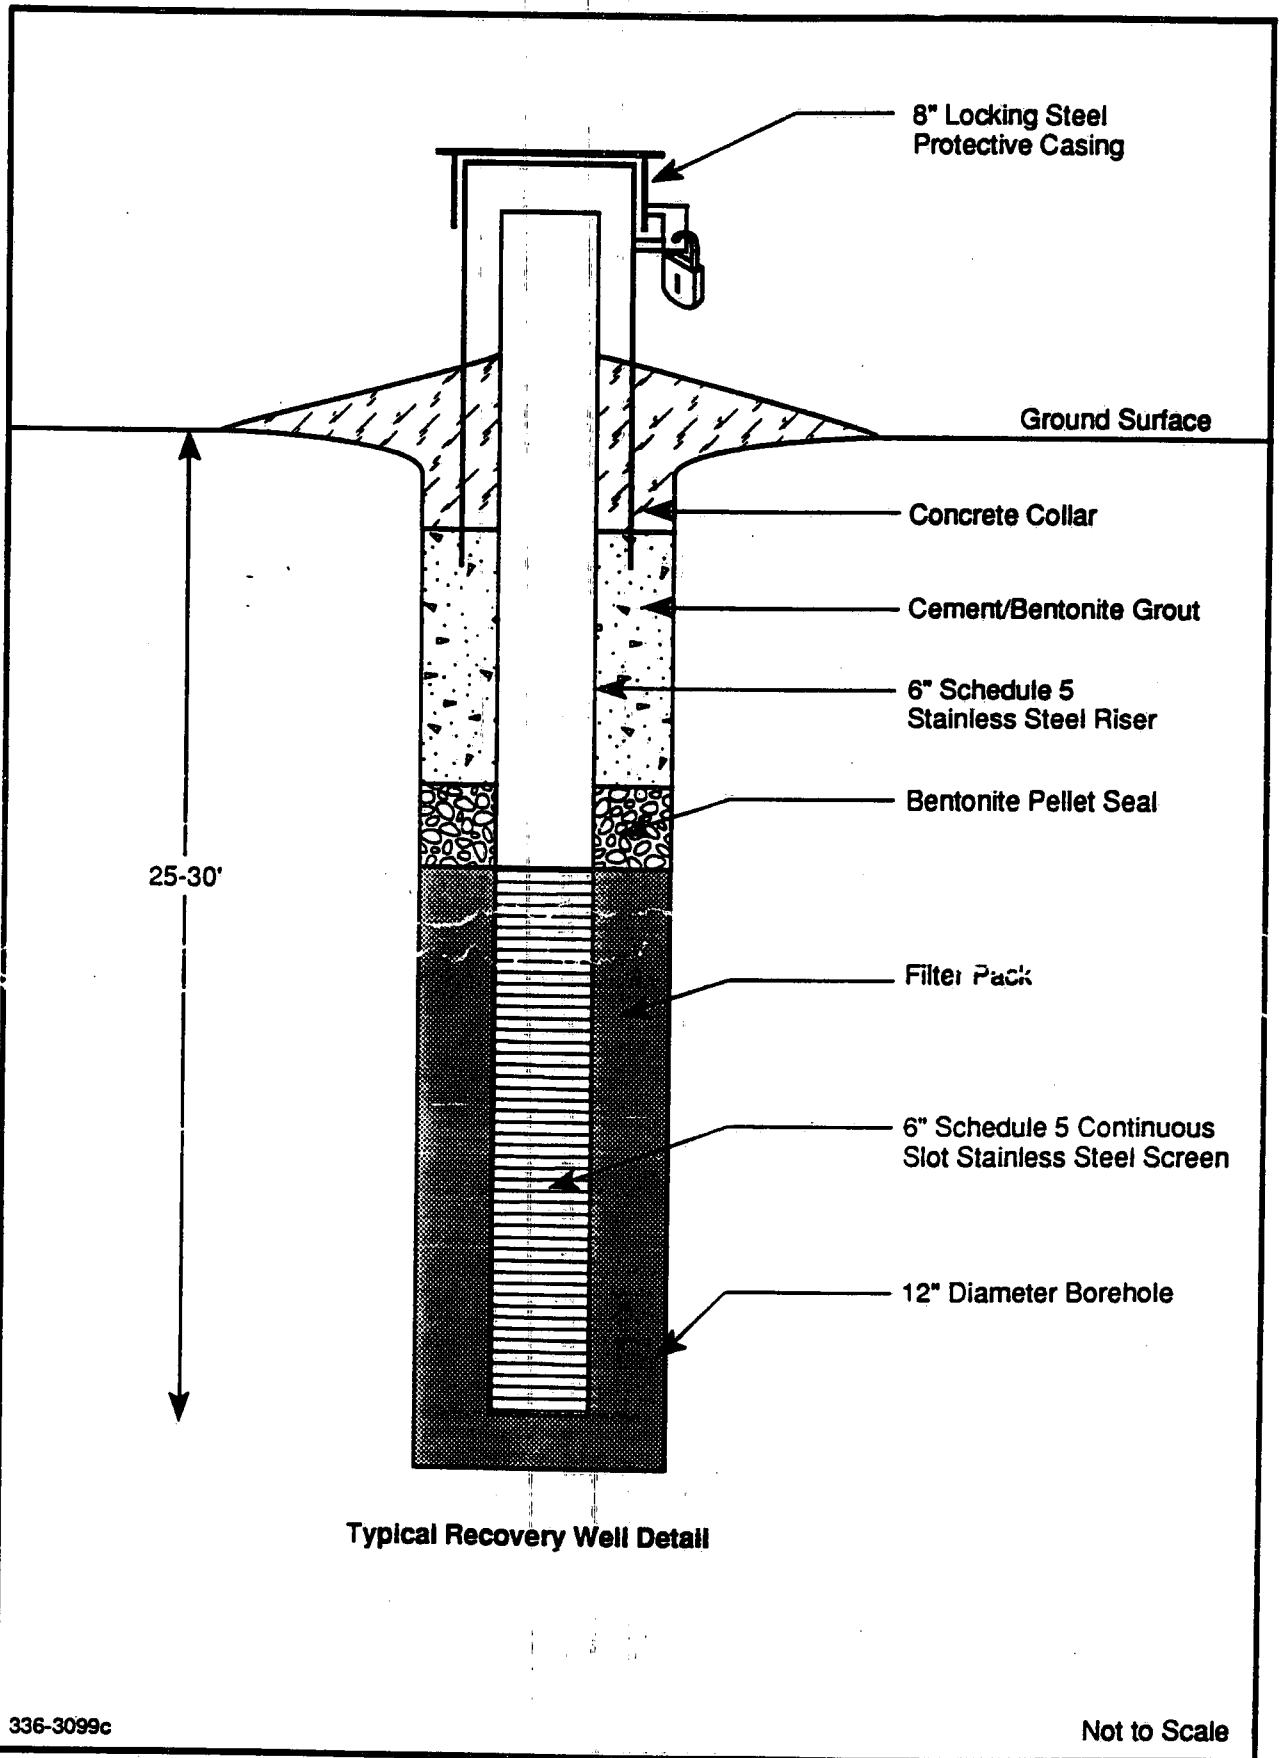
ADDITIONAL RECOVERY WELL ALTERNATIVE: CONSTRUCTION DETAIL
